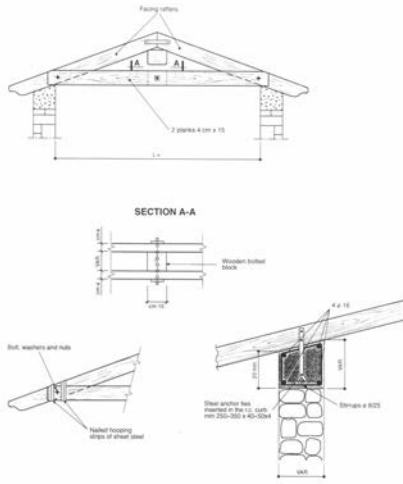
B: Seismic Strengthening - Installation of a New RC Beam at the Roof Level
